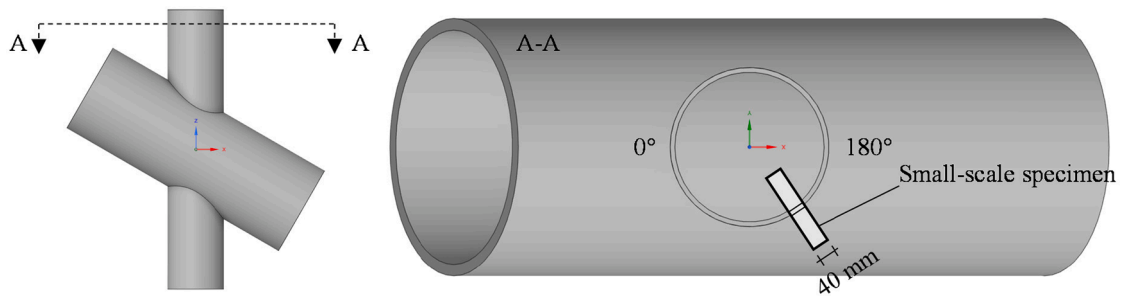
Derivation of the technical crack criterion for the welded tubular joints based on the fatigue tests on 40 mm small scale specimens tested by Seeger et al. [37,38].
